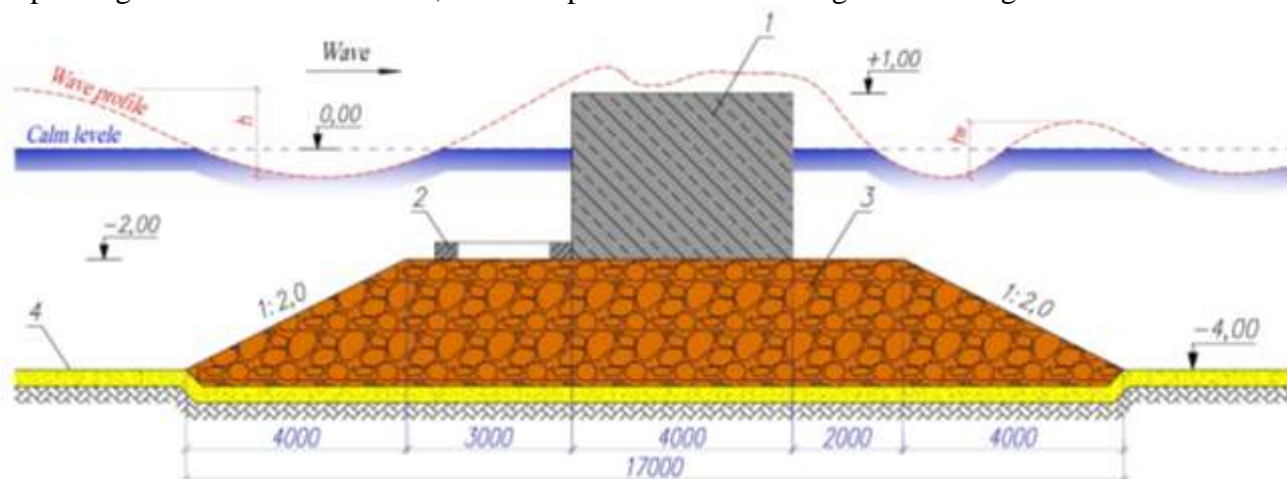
Cross section of the construction of a breakwater of an incomplete vertical profile:
